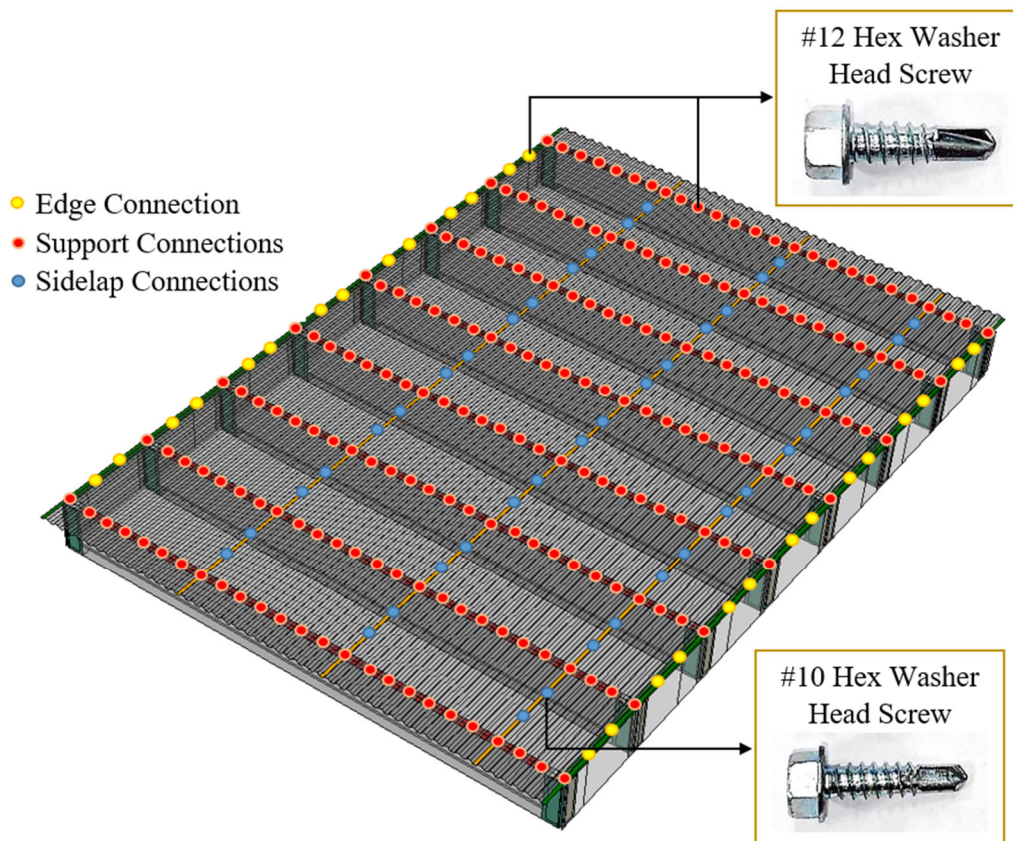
Photograph and Location of the Fasteners Attaching Steel Deck to the CFS Frame
